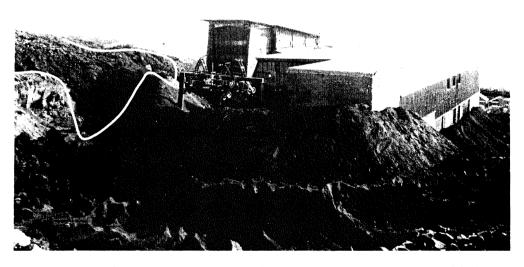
The protective earth dam around the ski station at Rifugia Sapienza. Note the lava flow to the left of the photo (outlined in white).
